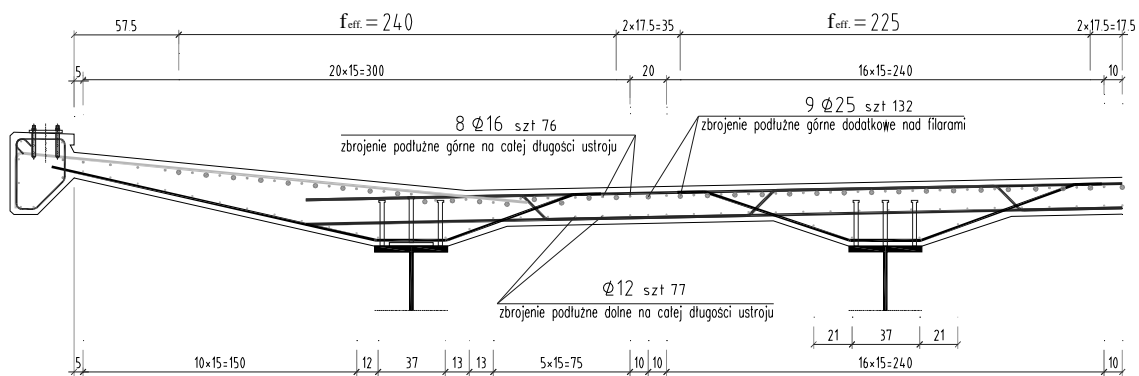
The reinforcement of composite bridge in Neple over the Krzna River, the cross-section in over pillar axe; designer - eng. G. Zieliński
